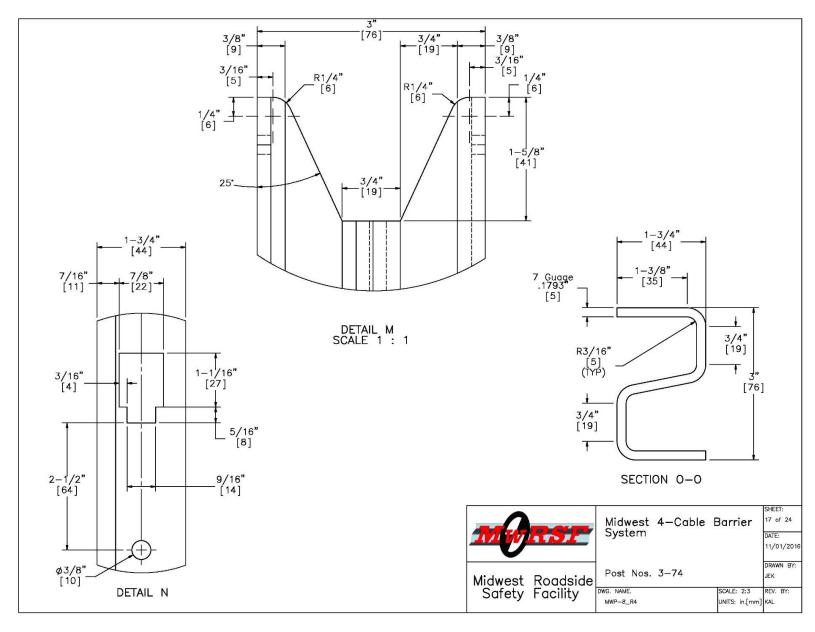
Midwest Weak Post Details, Test No. MWP-8
